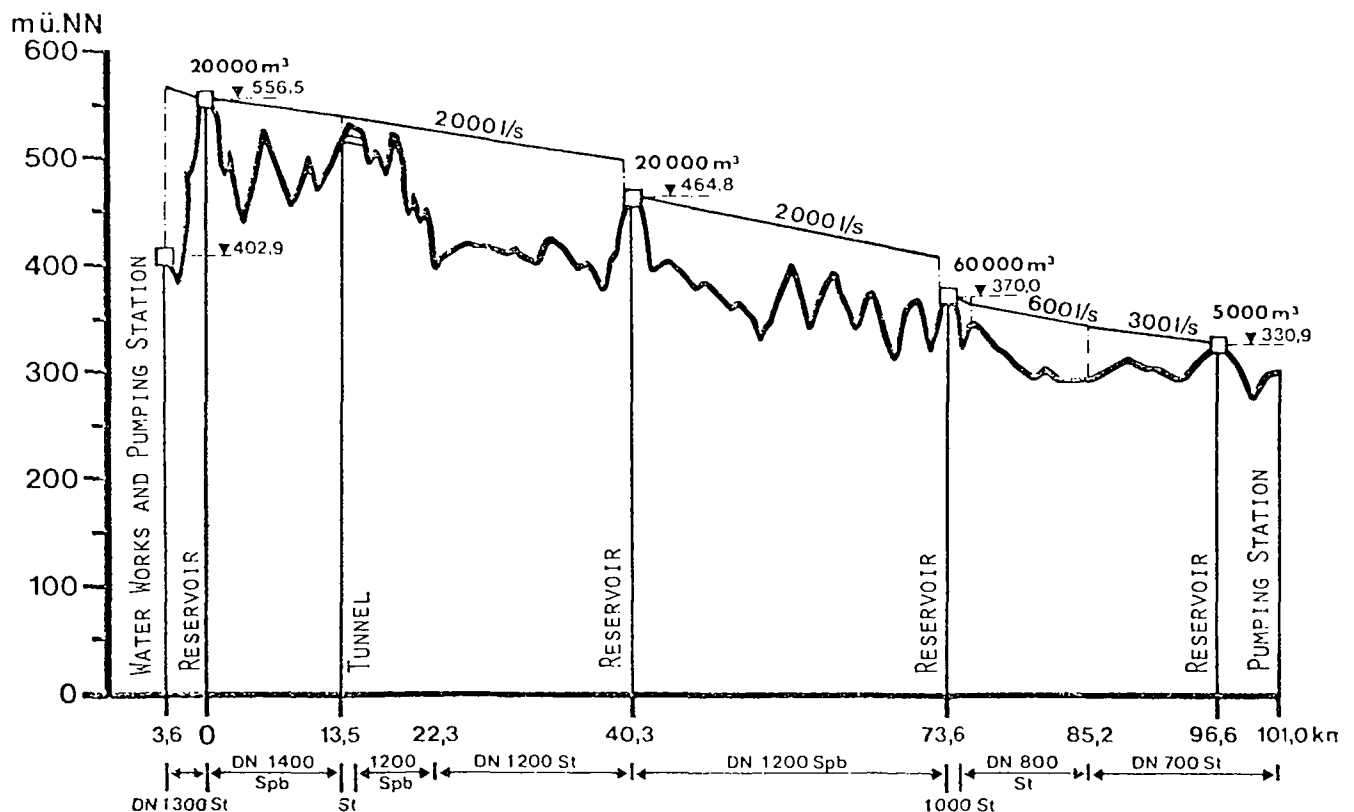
Longitudinal section of the Fränkischer Wirtschaftsraum Water Supply
